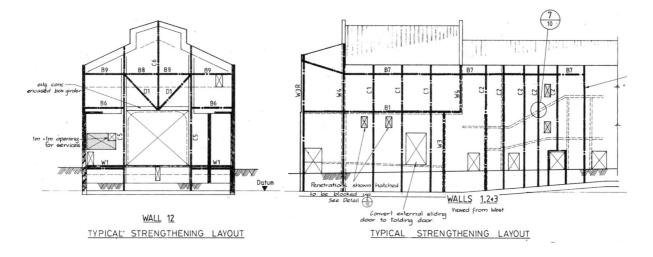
Strengthening layouts of the 1977-85 seismic renovations of the Wellington Opera House (Christianson, 1983)
